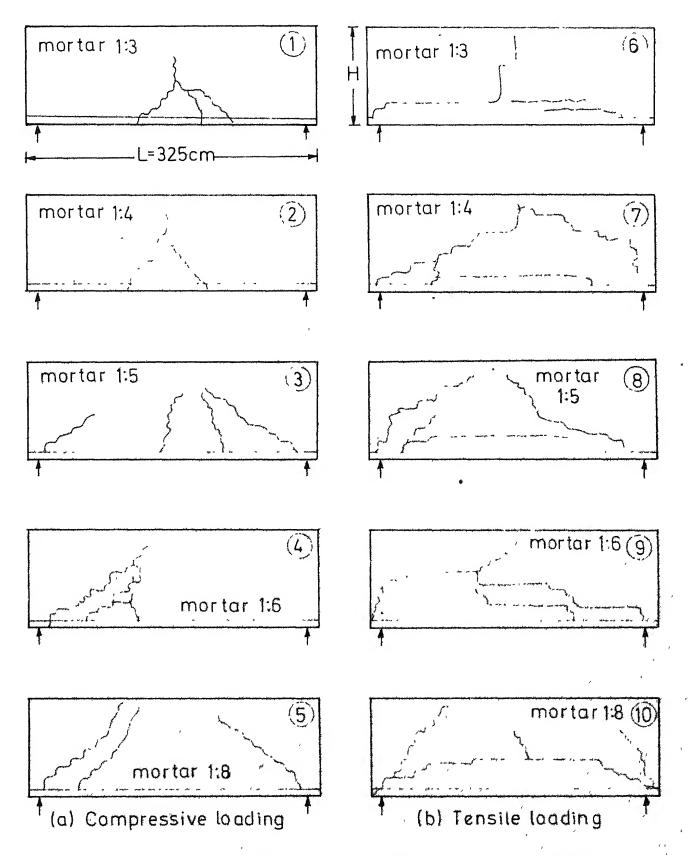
Crack pattern at failure (H/L=0-33)
